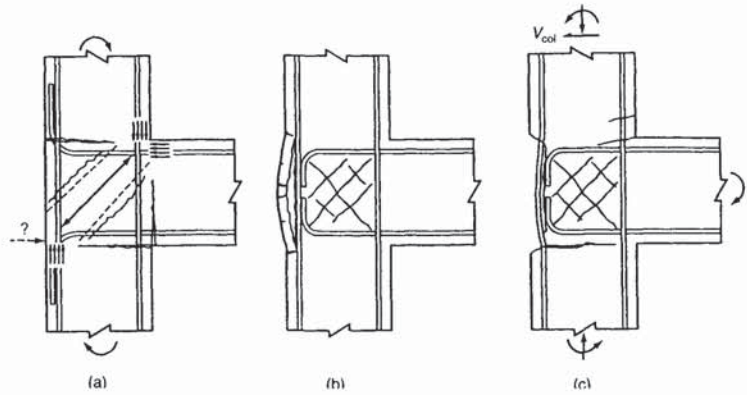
Breakdown of unreinforced exterior joints: (a) beam bars bent away from joint; (b) beam bars bent in — cover cracking at back of joint; (c) loss of joint integrity
